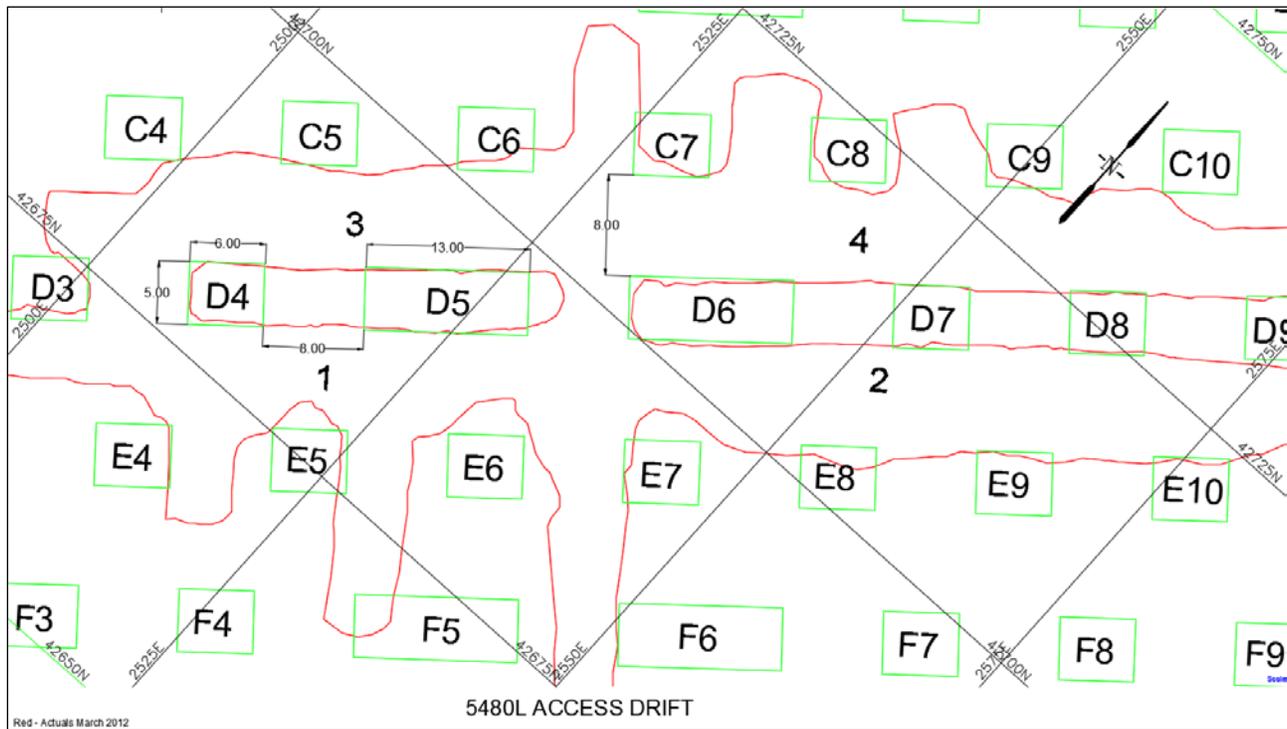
Pillar Layout and Naming Convention (Trevali 2012)
